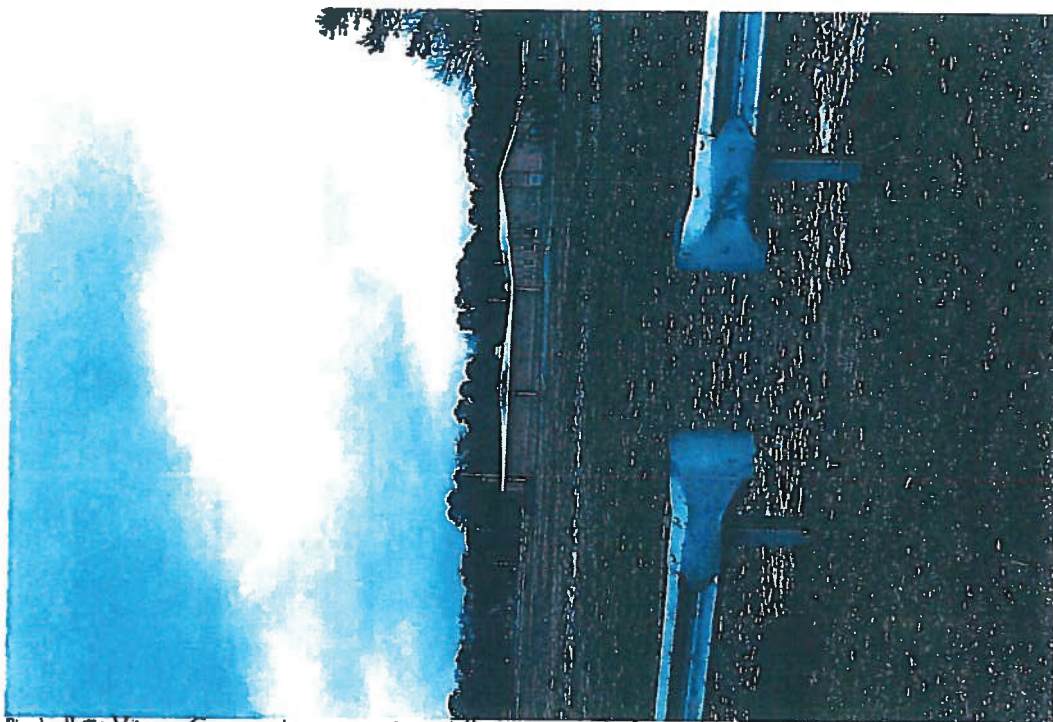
View from parking area @ end/beginning of trail toward Collings Lakes School
